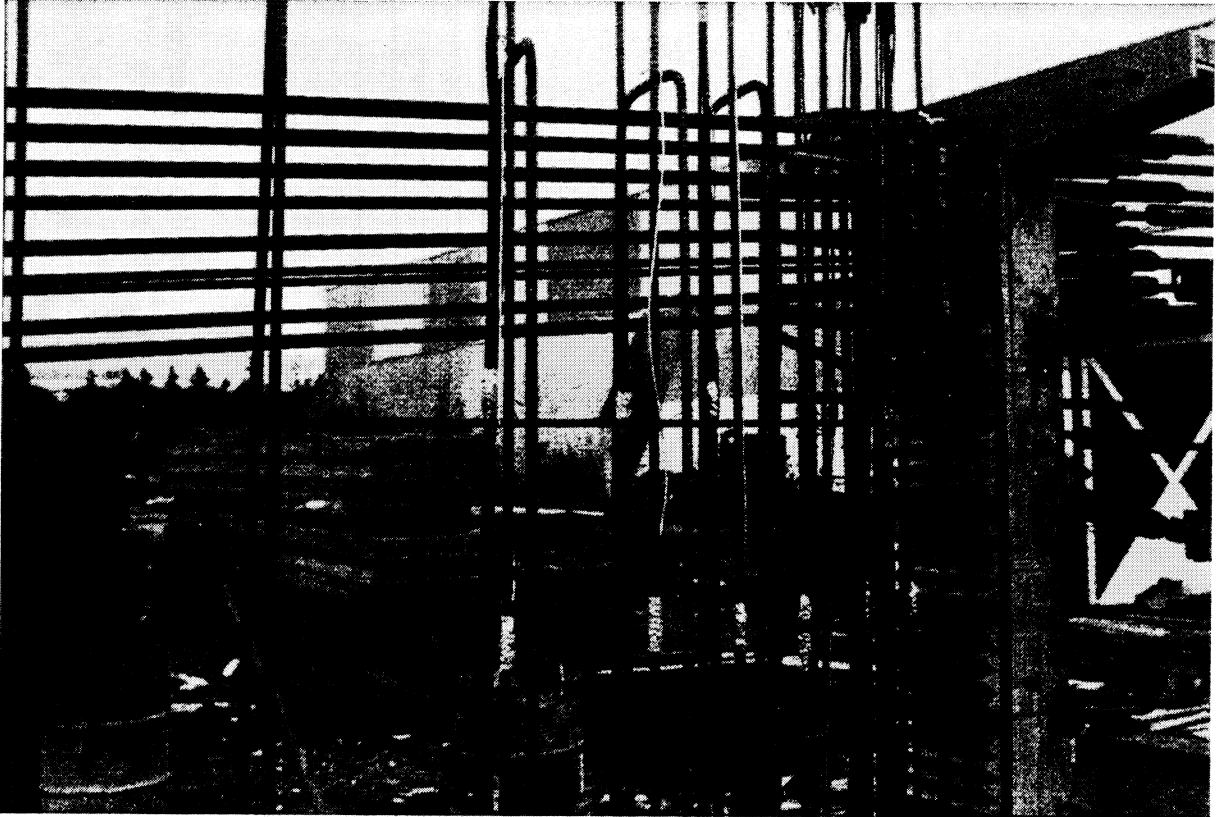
Field Test - Arranging the Stirrups for Manufacturing Girder 5D
